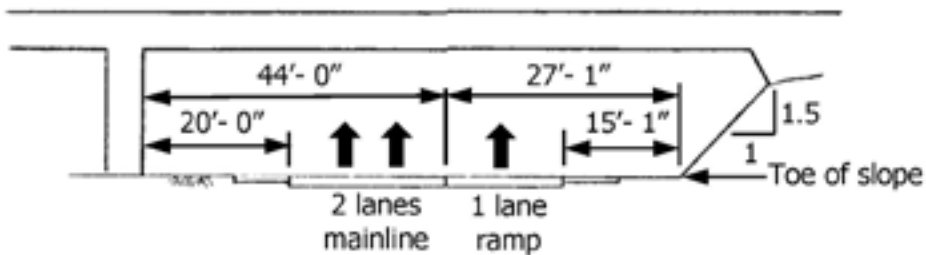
Bridge elevation view of horizontal clearances for a highway feature below the bridge carrying mainline and ramp.
